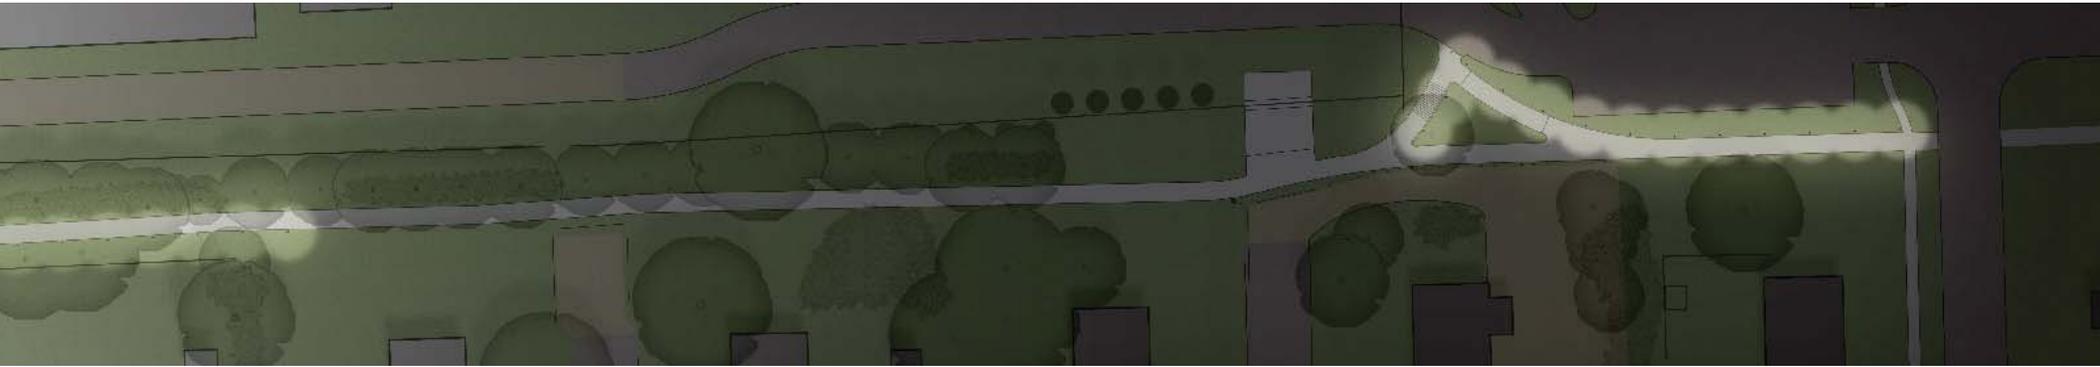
Vignette showing proposed ramp and stairs in Design Alternative B
